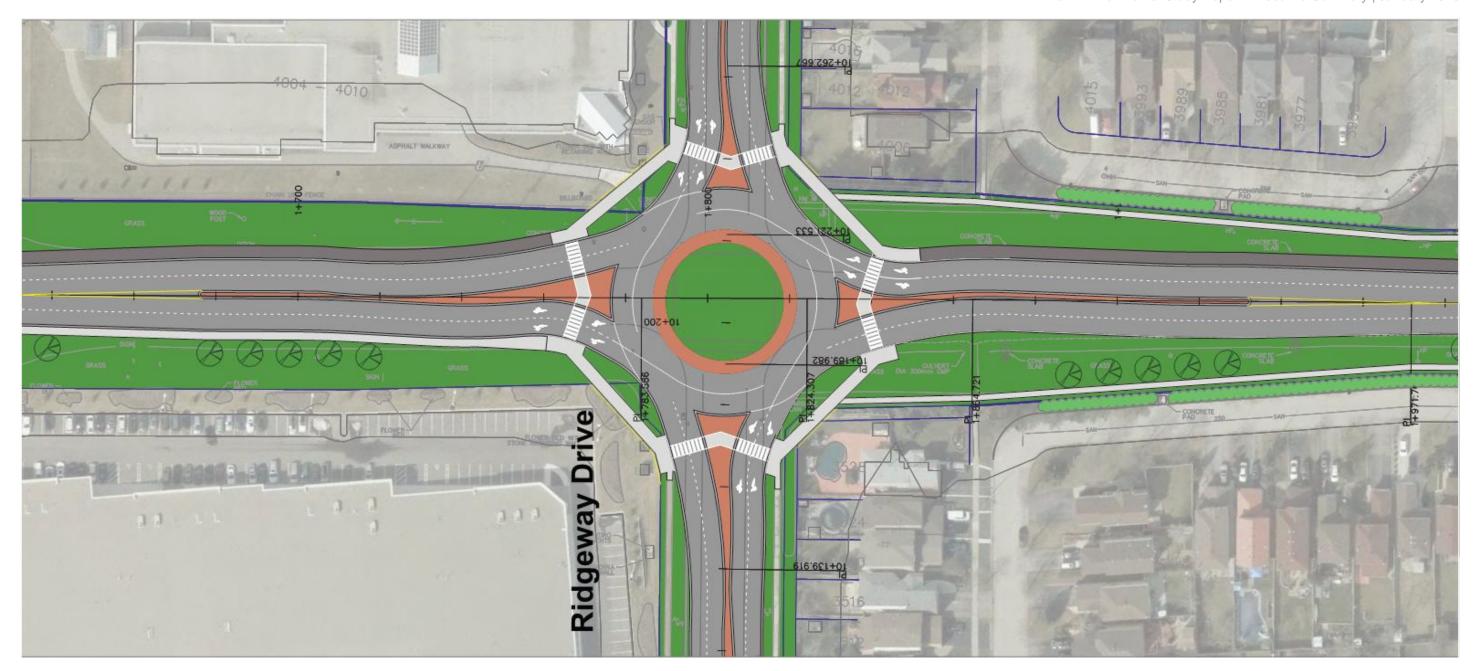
Alternative Design Concept #5 - Widen Burnhamthorpe Road West to 4 Lanes with a Roundabout at Ridgeway Drive
